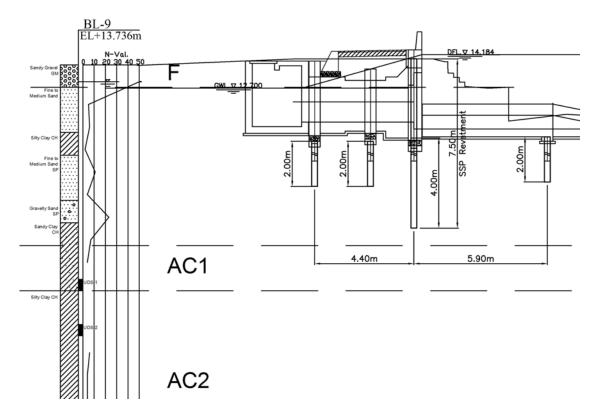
Length of SSP Cut off Wall (2/9) (MSL-2)
